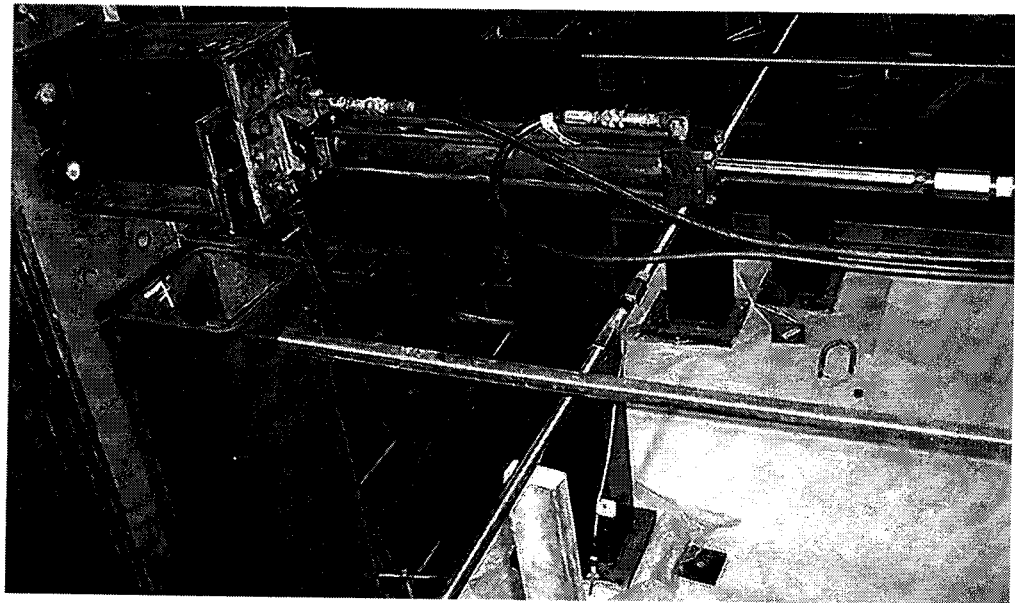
Horizontal Jack Attached to Steel Reaction Frame
